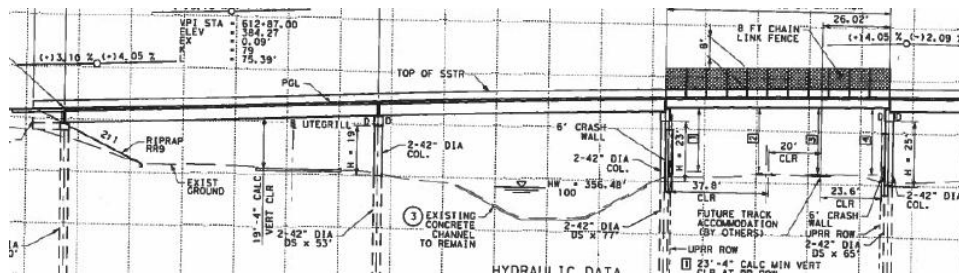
16 Bastrop SH71 Bridge Elevation View Drawing (TxDOT)
